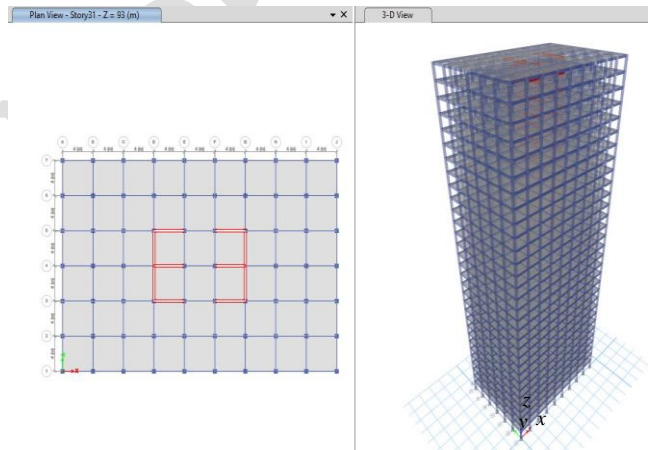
Model 8-Buildings with shear wall located at the center in E-shape
